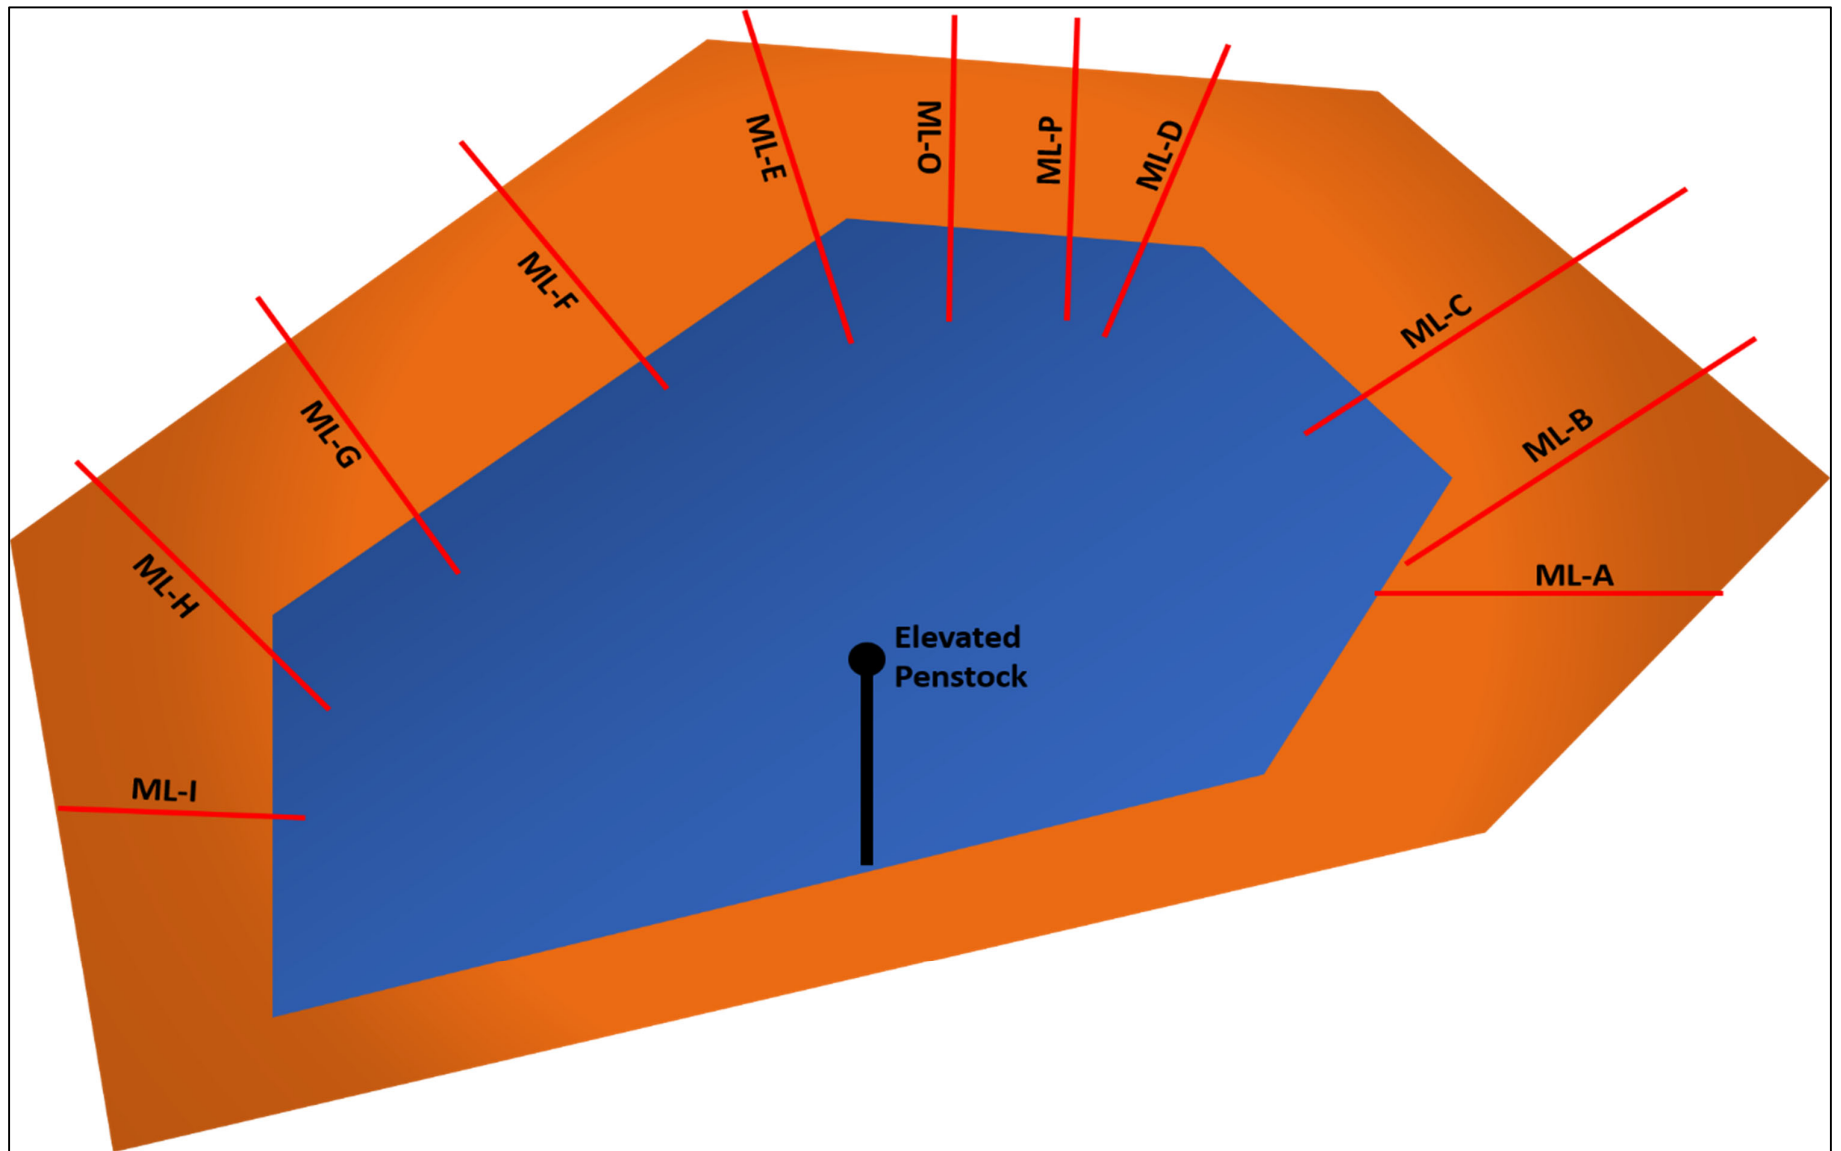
Schematic Drawing of TSF-A Monitoring Line Layout Plan.
